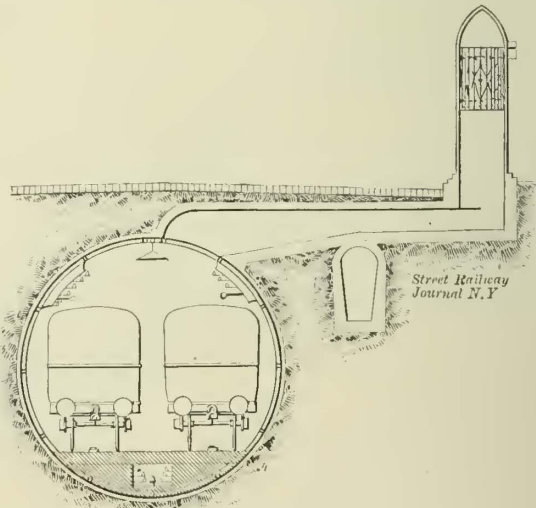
PROPOSED PARIS SUBWAY—SECTION.
